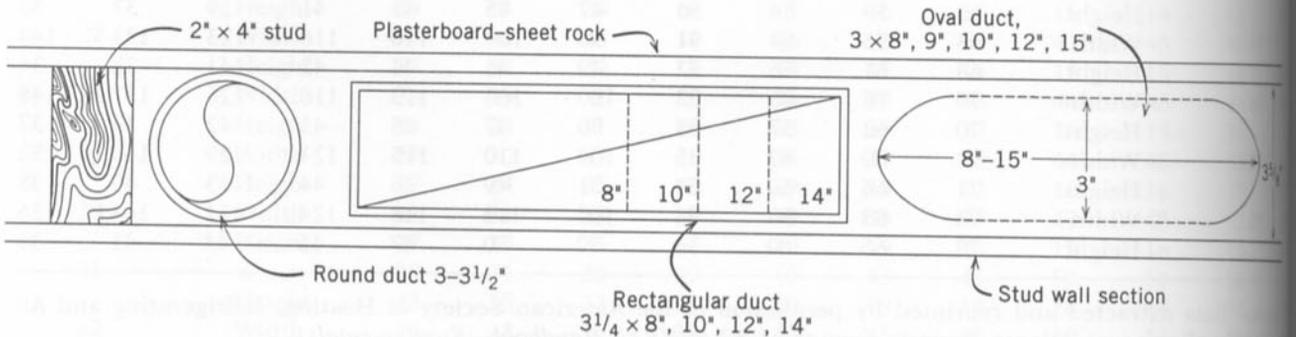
The restricted width of a stud wall (3⁵/₈ in.) requires use of rectangular or oval ducts. Rectangular ducts for use as stacks in stud walls are available in the sizes shown.
